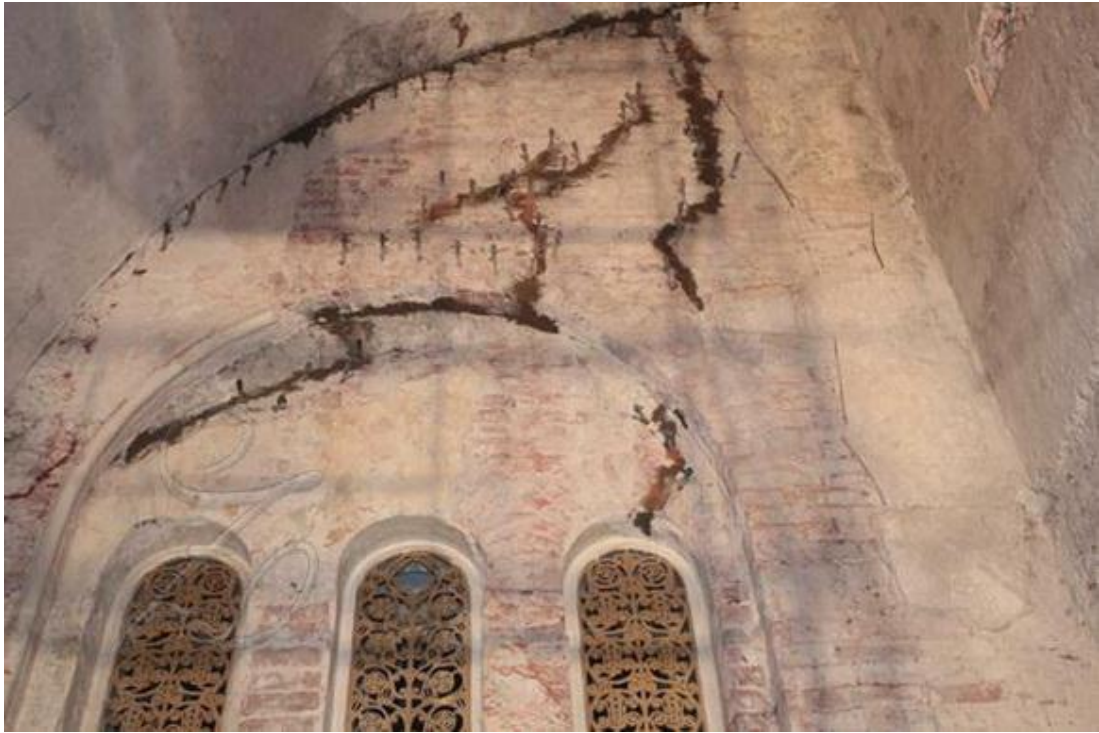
Cracks in masonry of a counterfort.
